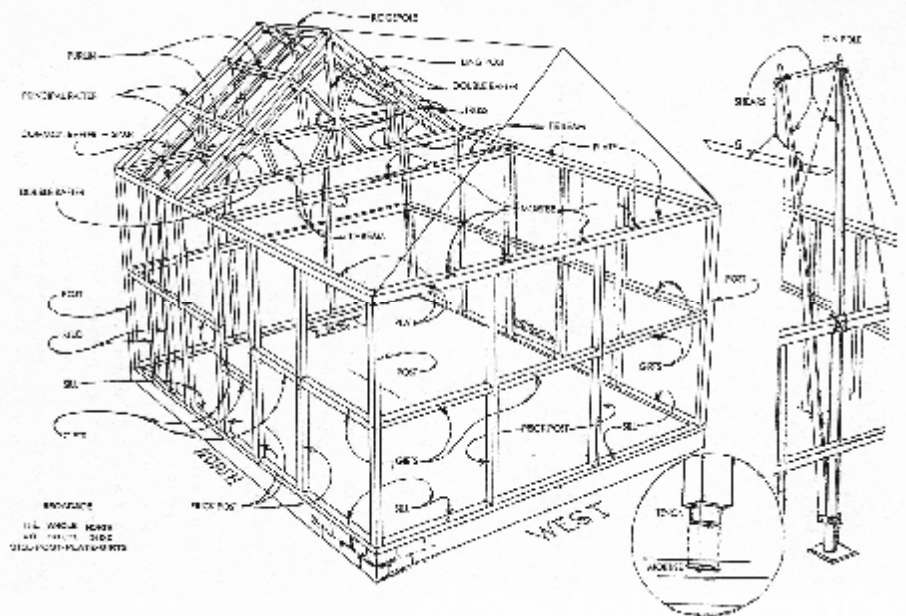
The parts of a meetinghouse frame. Drawing by John W. Blanch.
